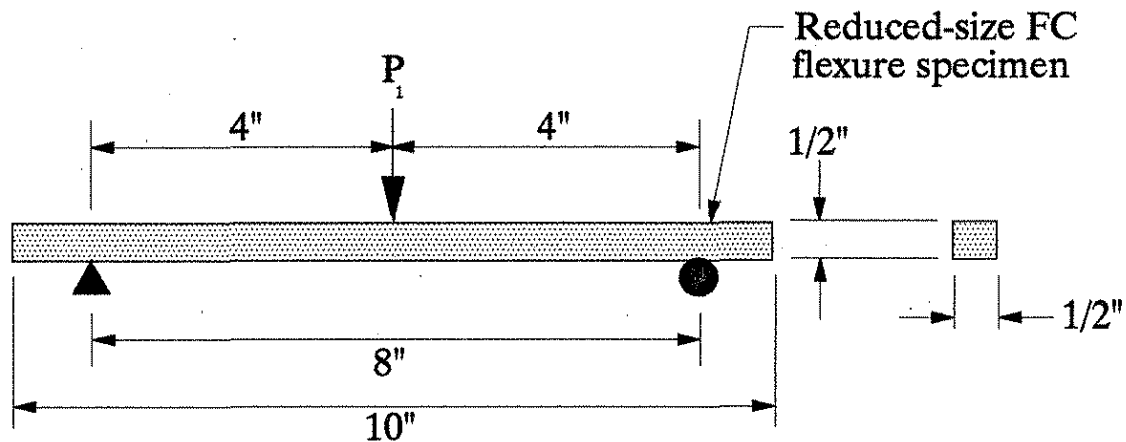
Test setup for flexural testing of specimens cut from FC dowels (reduced-size specimens)
